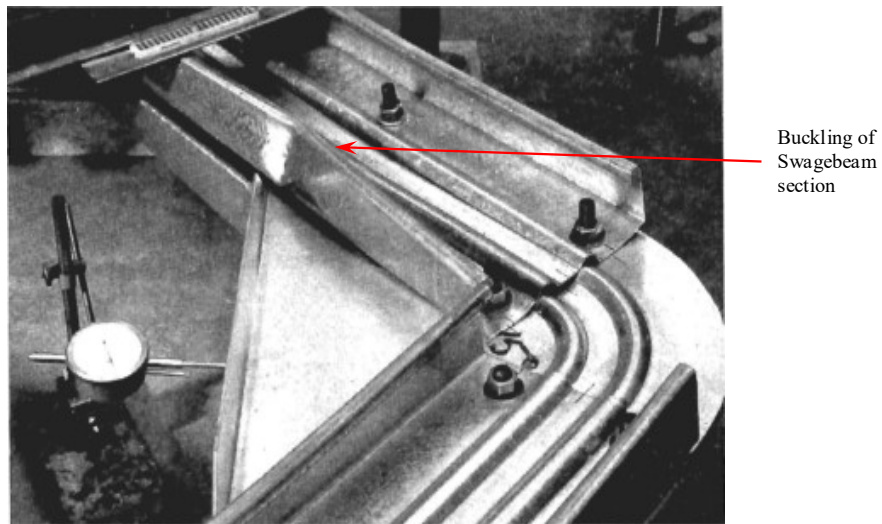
Failure of Swagebeam portal frame joint due to joint arrangement after Kirk (1986)
